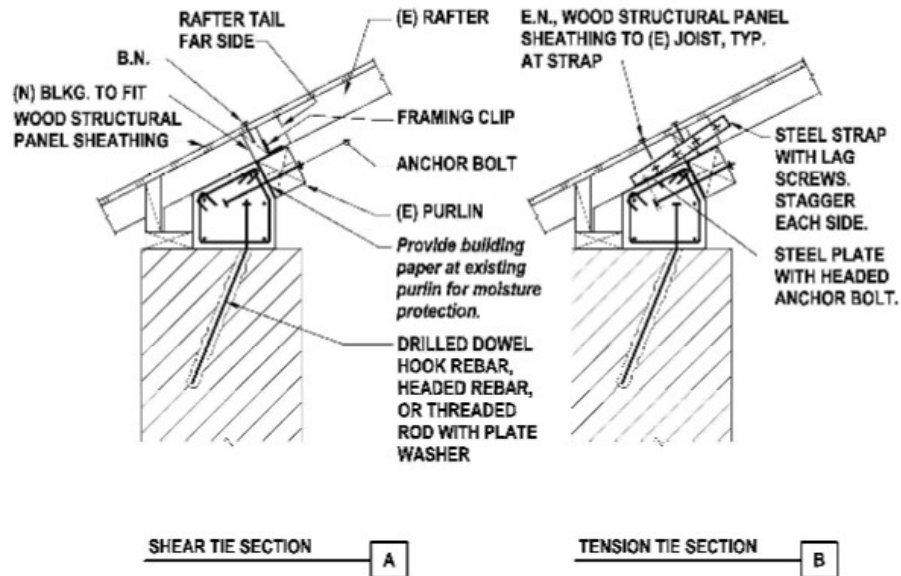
Bond Beam at a Sloping Roof
